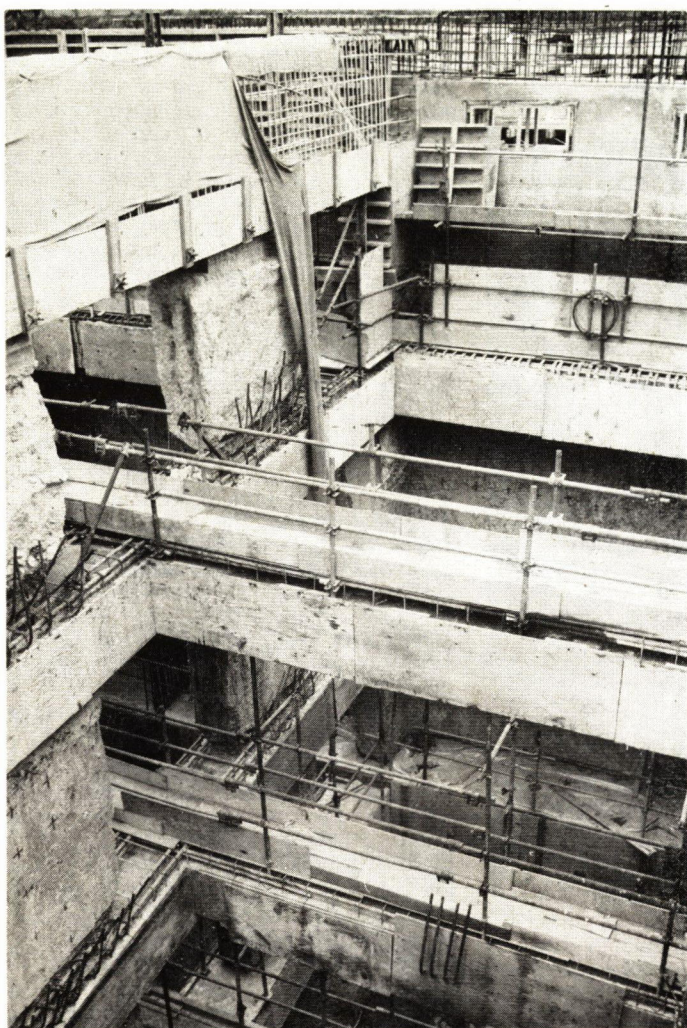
The control room for the tunnel was formed between 1.2m thick diaphragm walls up to 21m deep, with 600mm thick inner partition walls also formed by diaphragm walling. Excavation was in stages with ring beams and struts cast in-situ at each stage
